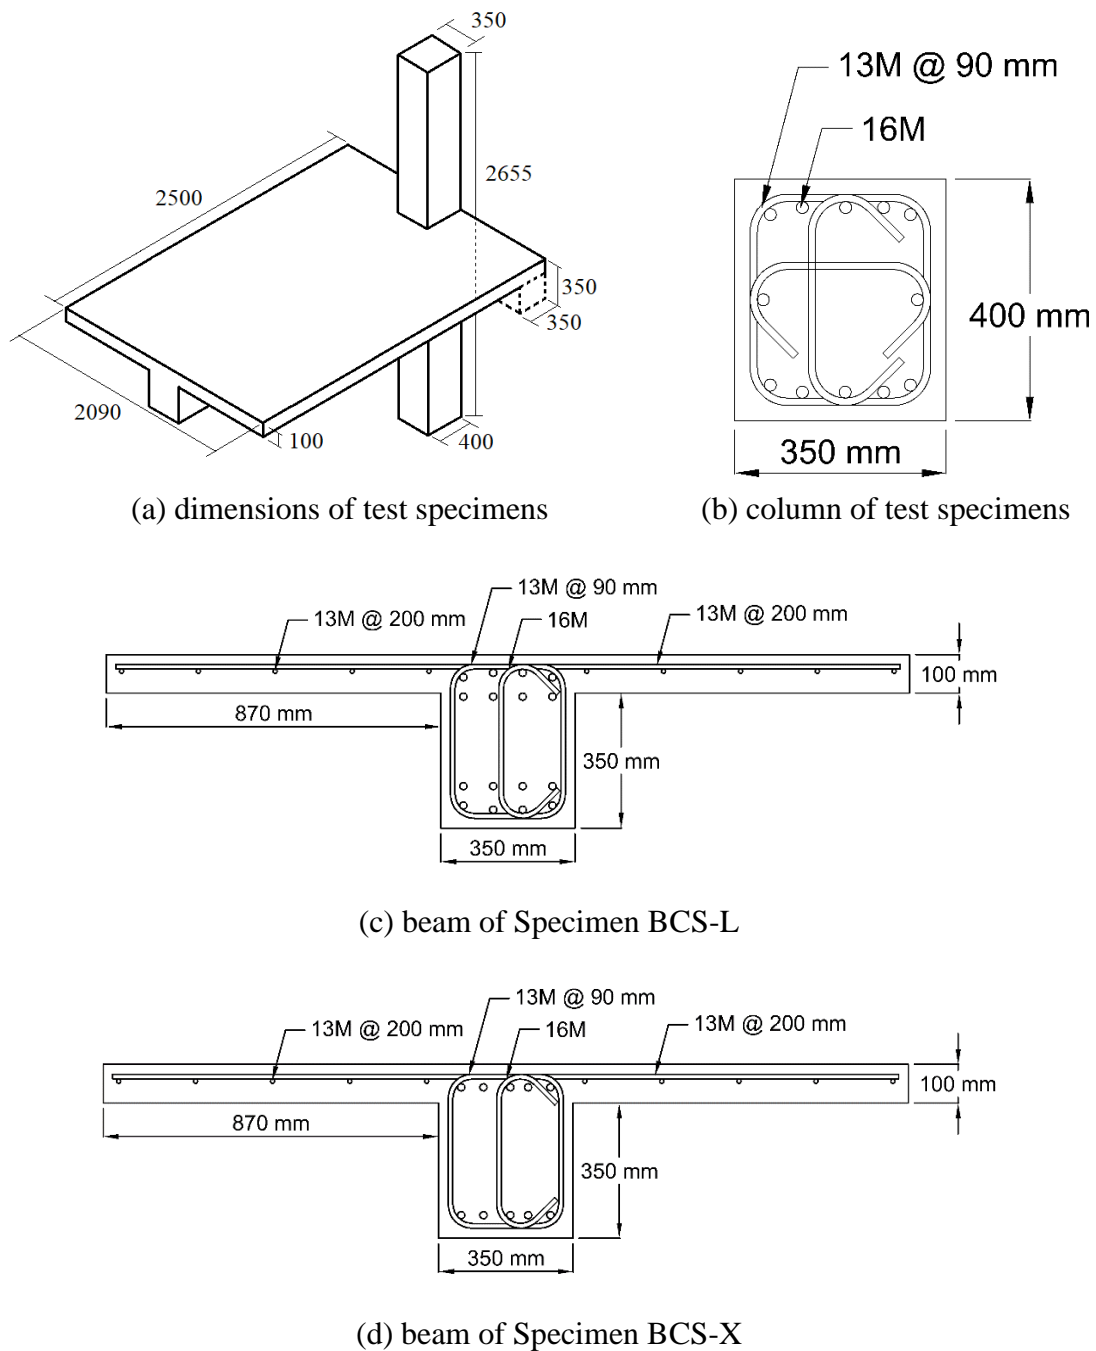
Dimensions and reinforcement detailing of test specimens.
